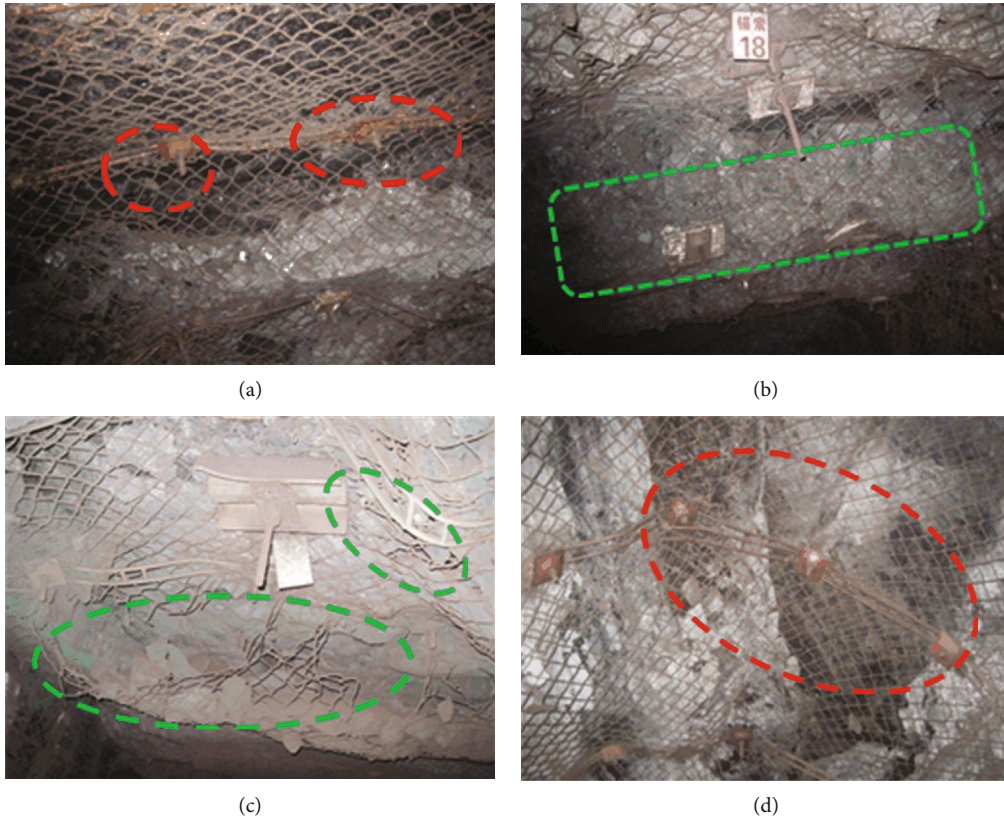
The deformation and support structure failure characteristic of surrounding rock. (a) Water-dripping corrosion of supporting structure; (b) roof subsidence; (c) mesh tearing and trapezoidal beam failure; (d) roof collapse.
